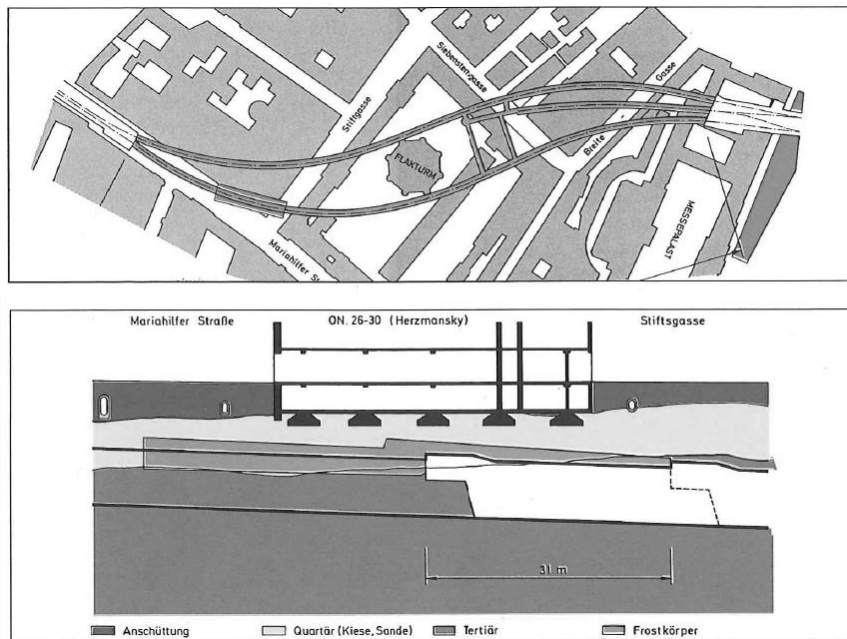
Location and longitudinal section of the freezing segment (after Hinkel, 1991)
